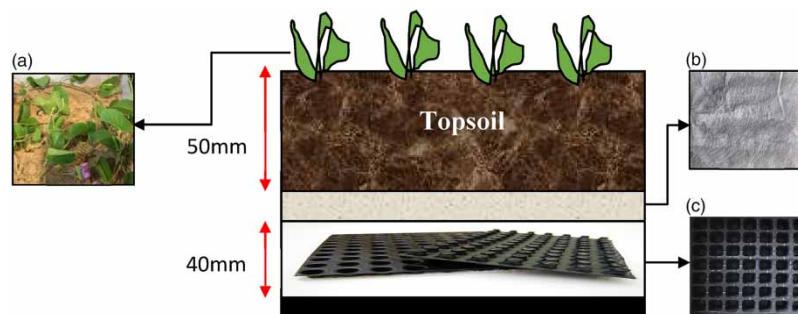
| Commercial green roof model (CGR) with (a) beach morning glory, (b) non-woven geotextile, and (c) drainage plate.
